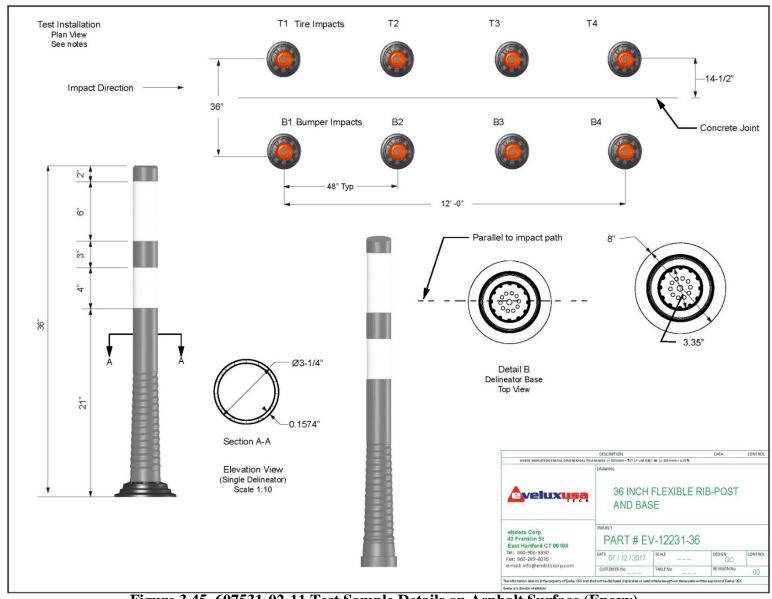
607531-02-11 Test Sample Details on Asphalt Surface (Epoxy).
